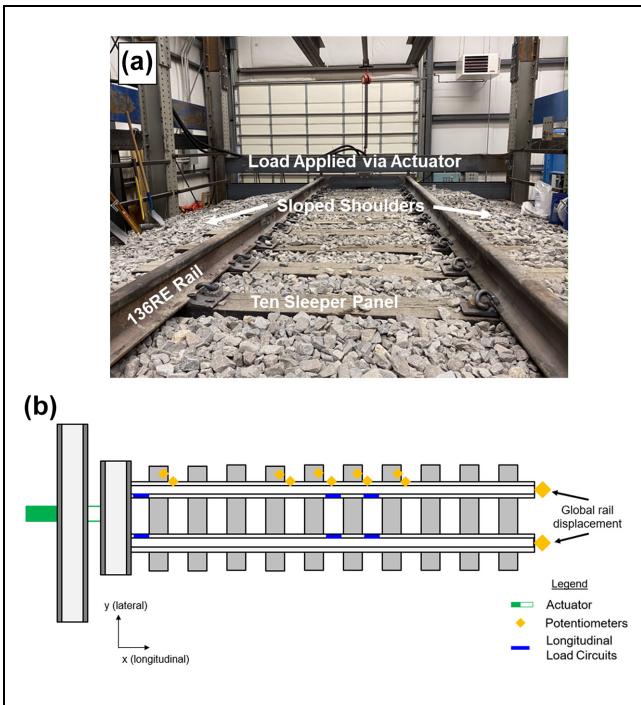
Timber sleeper track panel constructed with 136 RE rail, AREMA 4A ballast, full cribs and shoulders, 460 mm (18 in.) plates with four spikes per plate, and elastic fasteners (a) and track panel instrumentation overview (b).
